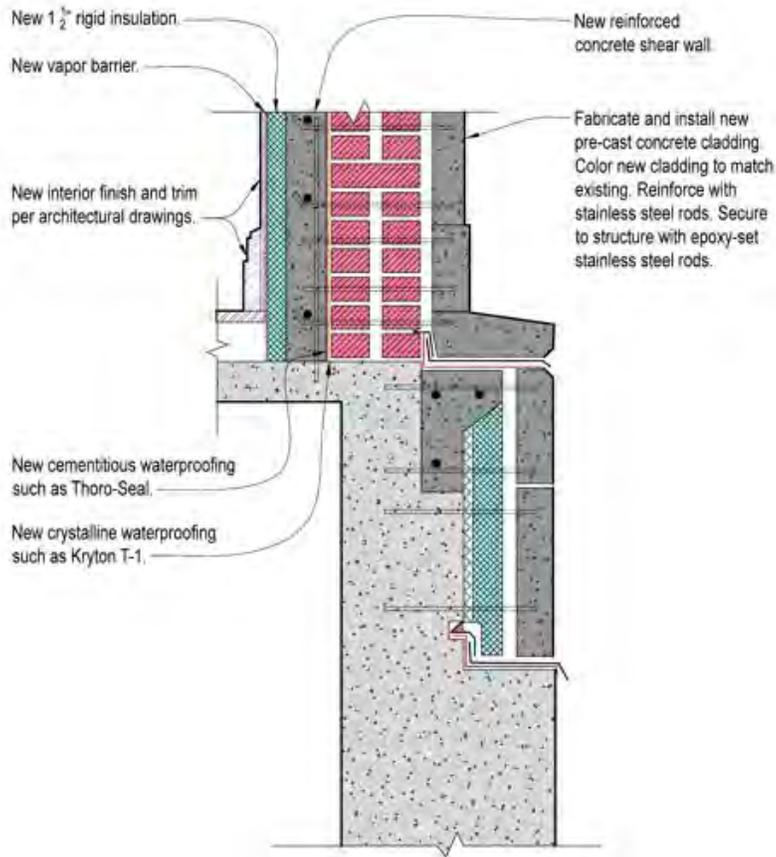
(1): Option 1 Restoration Approach at Stone Wall Base, South Side
